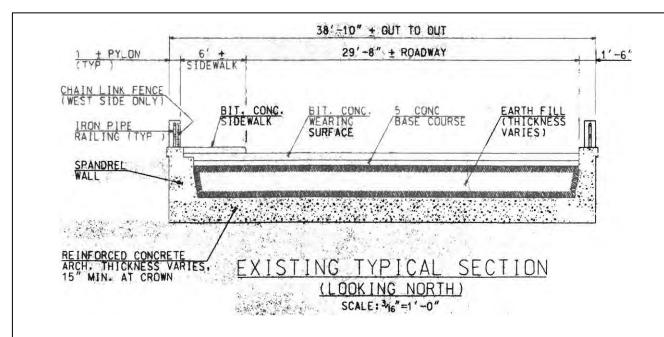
General Nomenclature of Existing Landing Road Bridge
